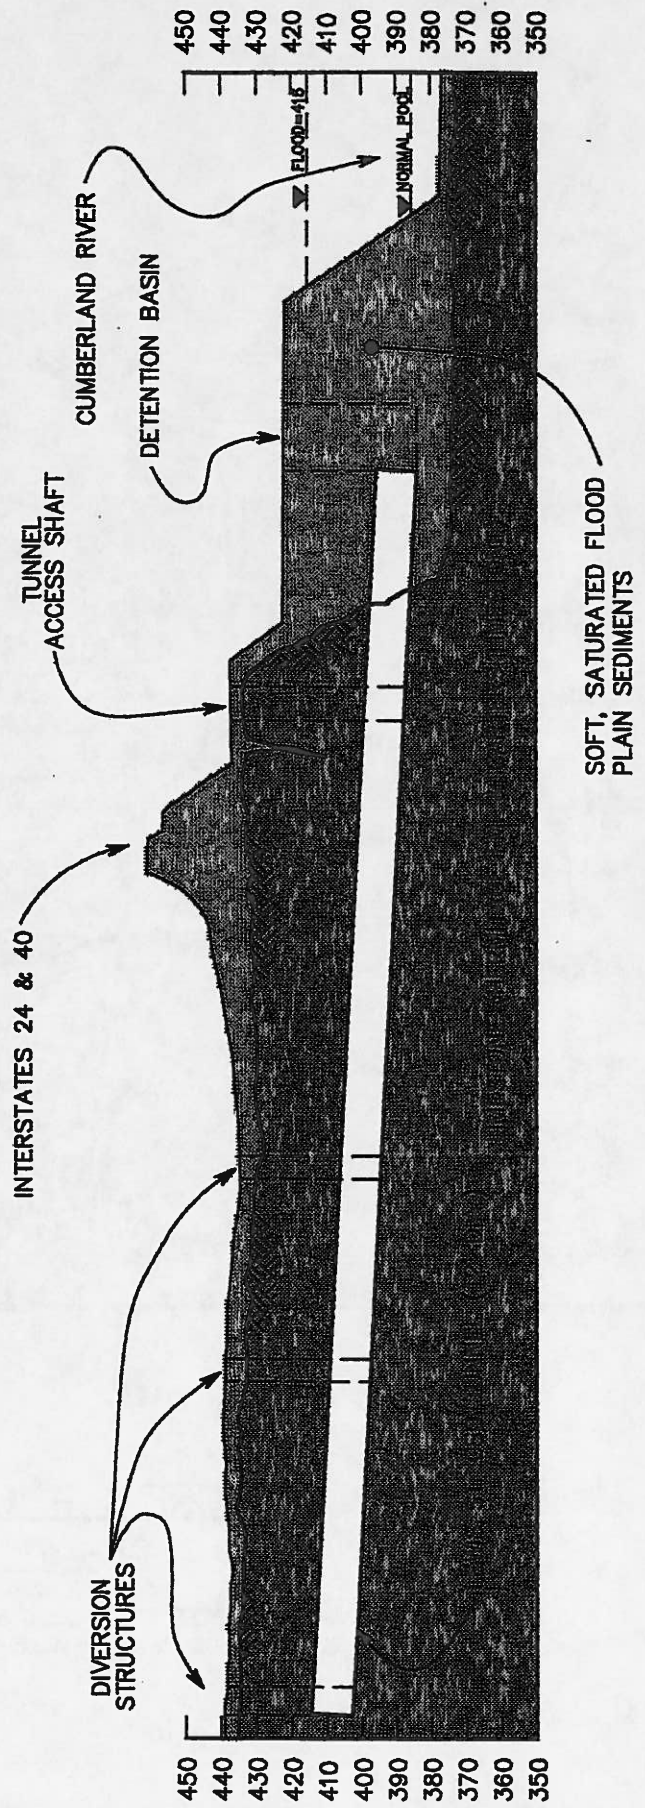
GENERALIZED TUNNEL PROFILE
